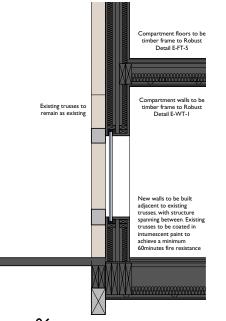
Typical section showing placement of walls, adjacent to trusses - New insulation within floors
